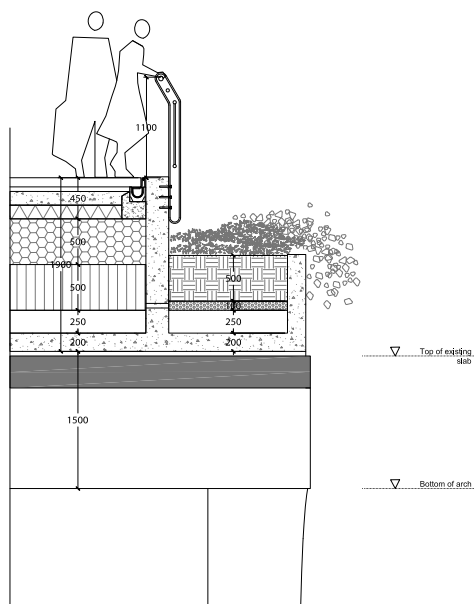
Proposed north edge detail to the Braithwaite Arches
